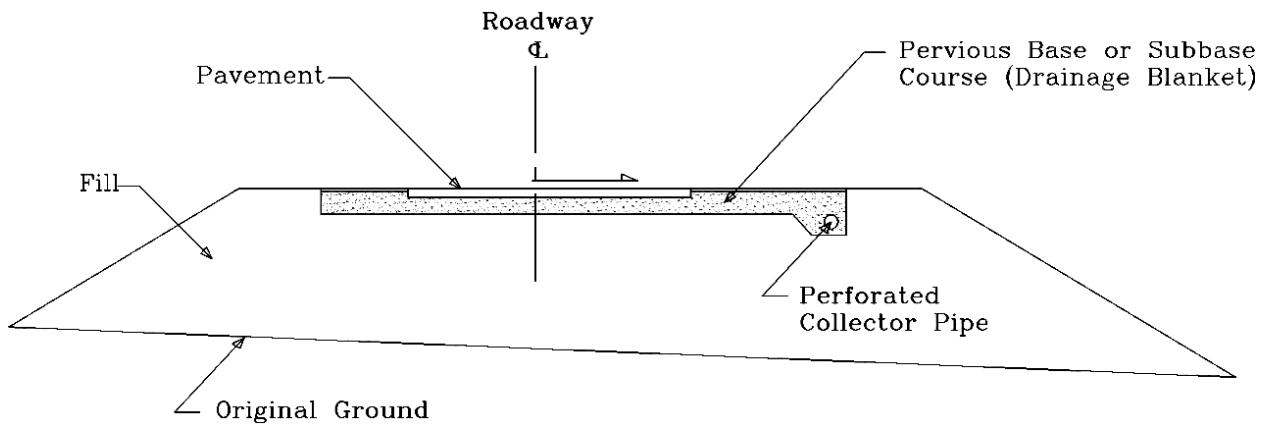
Longitudinal collector drain used to remove water seeping into pavement structural section (redrawn from: Moulton, 1980)
